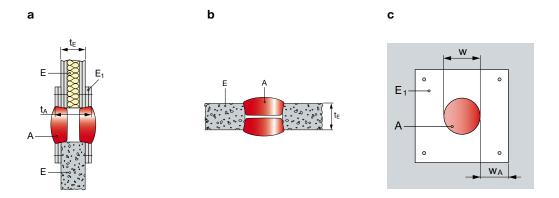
Aperture framing/beading and position of the seal in walls/floors
